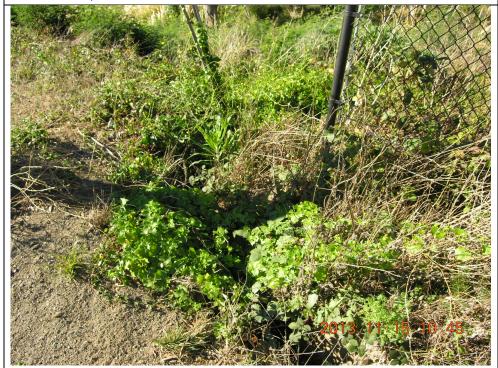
County inspection photo of road ditch draining onto Project site, November 15, 2013
